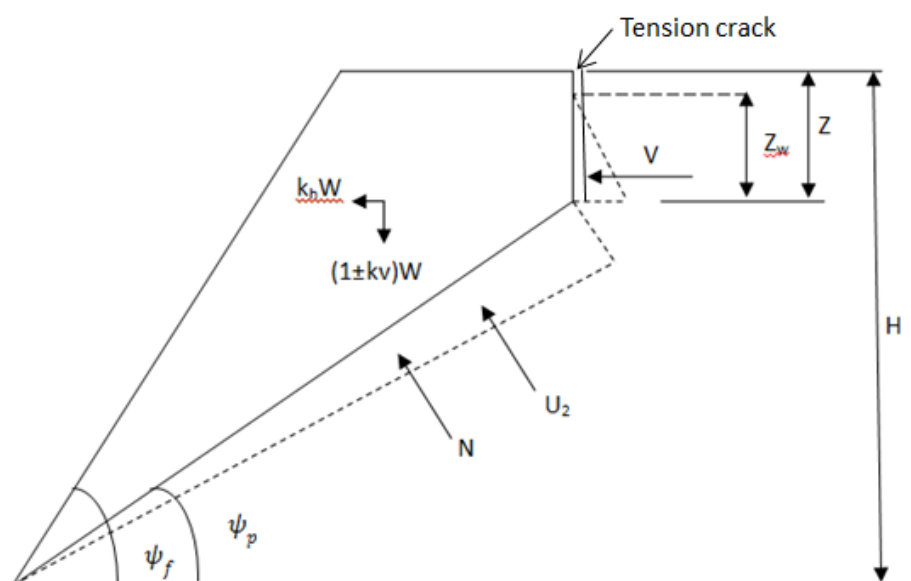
Mechanism of rock slope against plan failure with tension crack under self-weight, water forces, and horizontal and vertical seismic forces
